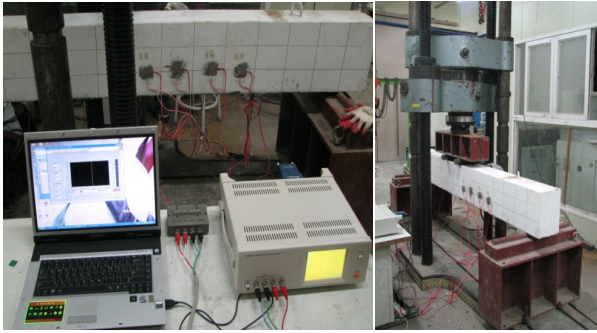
Experimental set up for concrete crack monitoring and concrete beam loading
